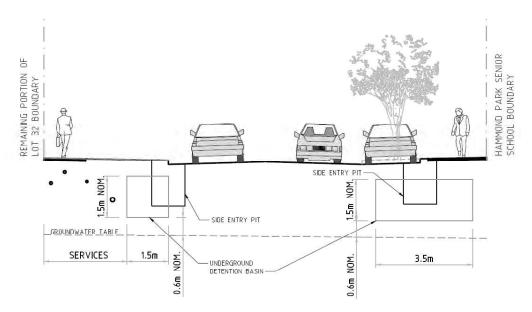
Eastern Road Cross Section indicating space for underground detention basins (length of road 171.1m)
